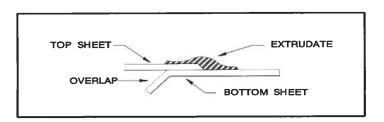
Fillet-Extruded Geomembrane Weld
